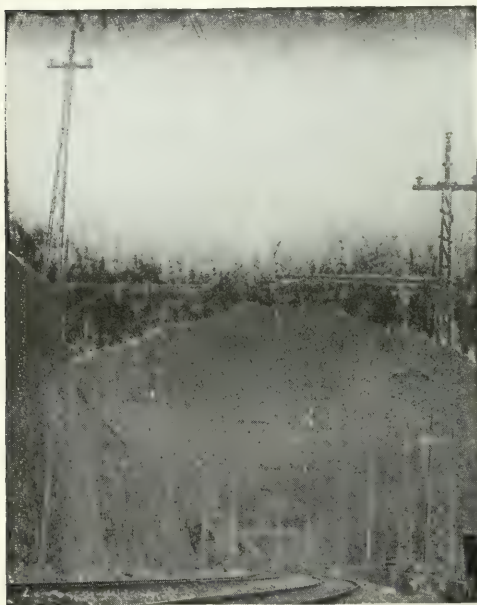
DETAILS OF OVERHEAD CONSTRUCTION USED ON GIOVI ROAD
